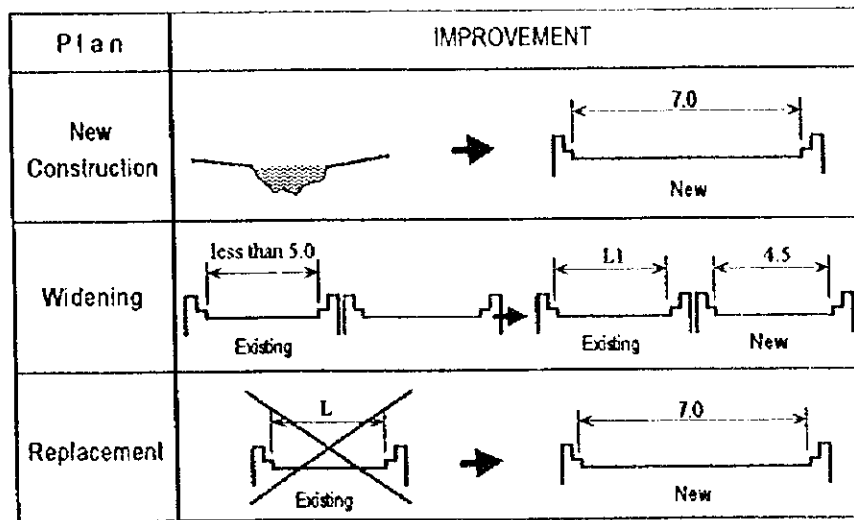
Bridge Improvement Plan for Road Link of Pre-F/S
